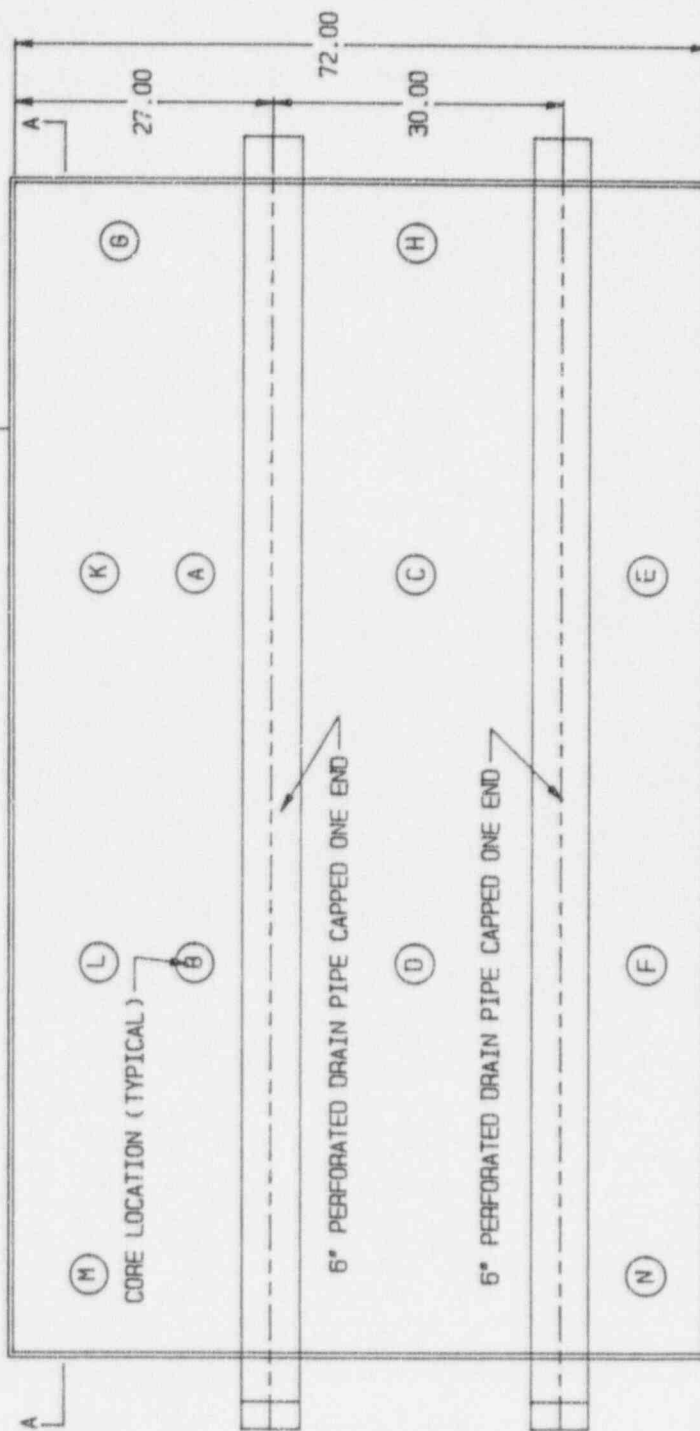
SINGLE LAYER SLAB PLAN VIEW
